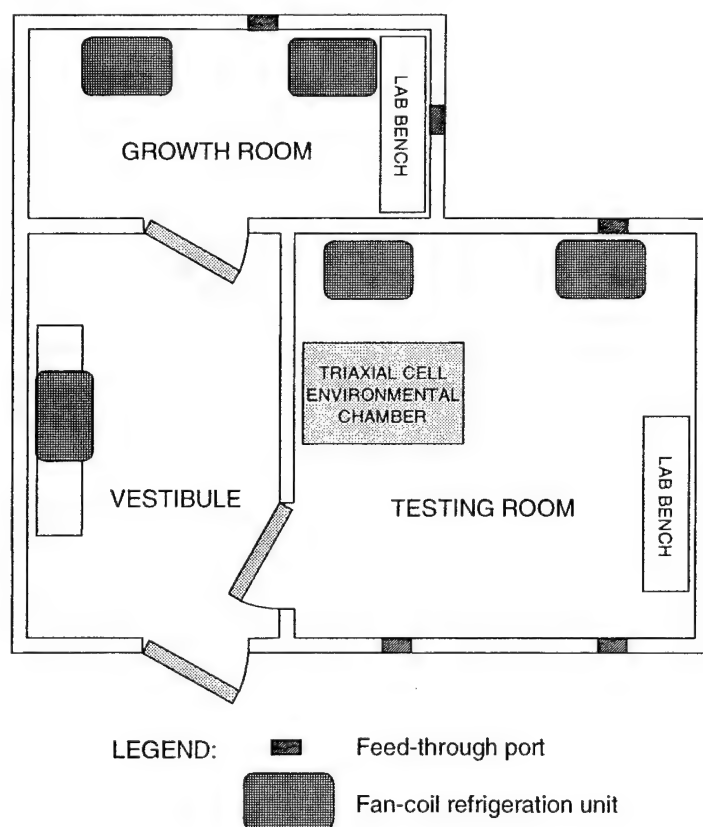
MIT Low Temperature Testing Facility (plan view).
